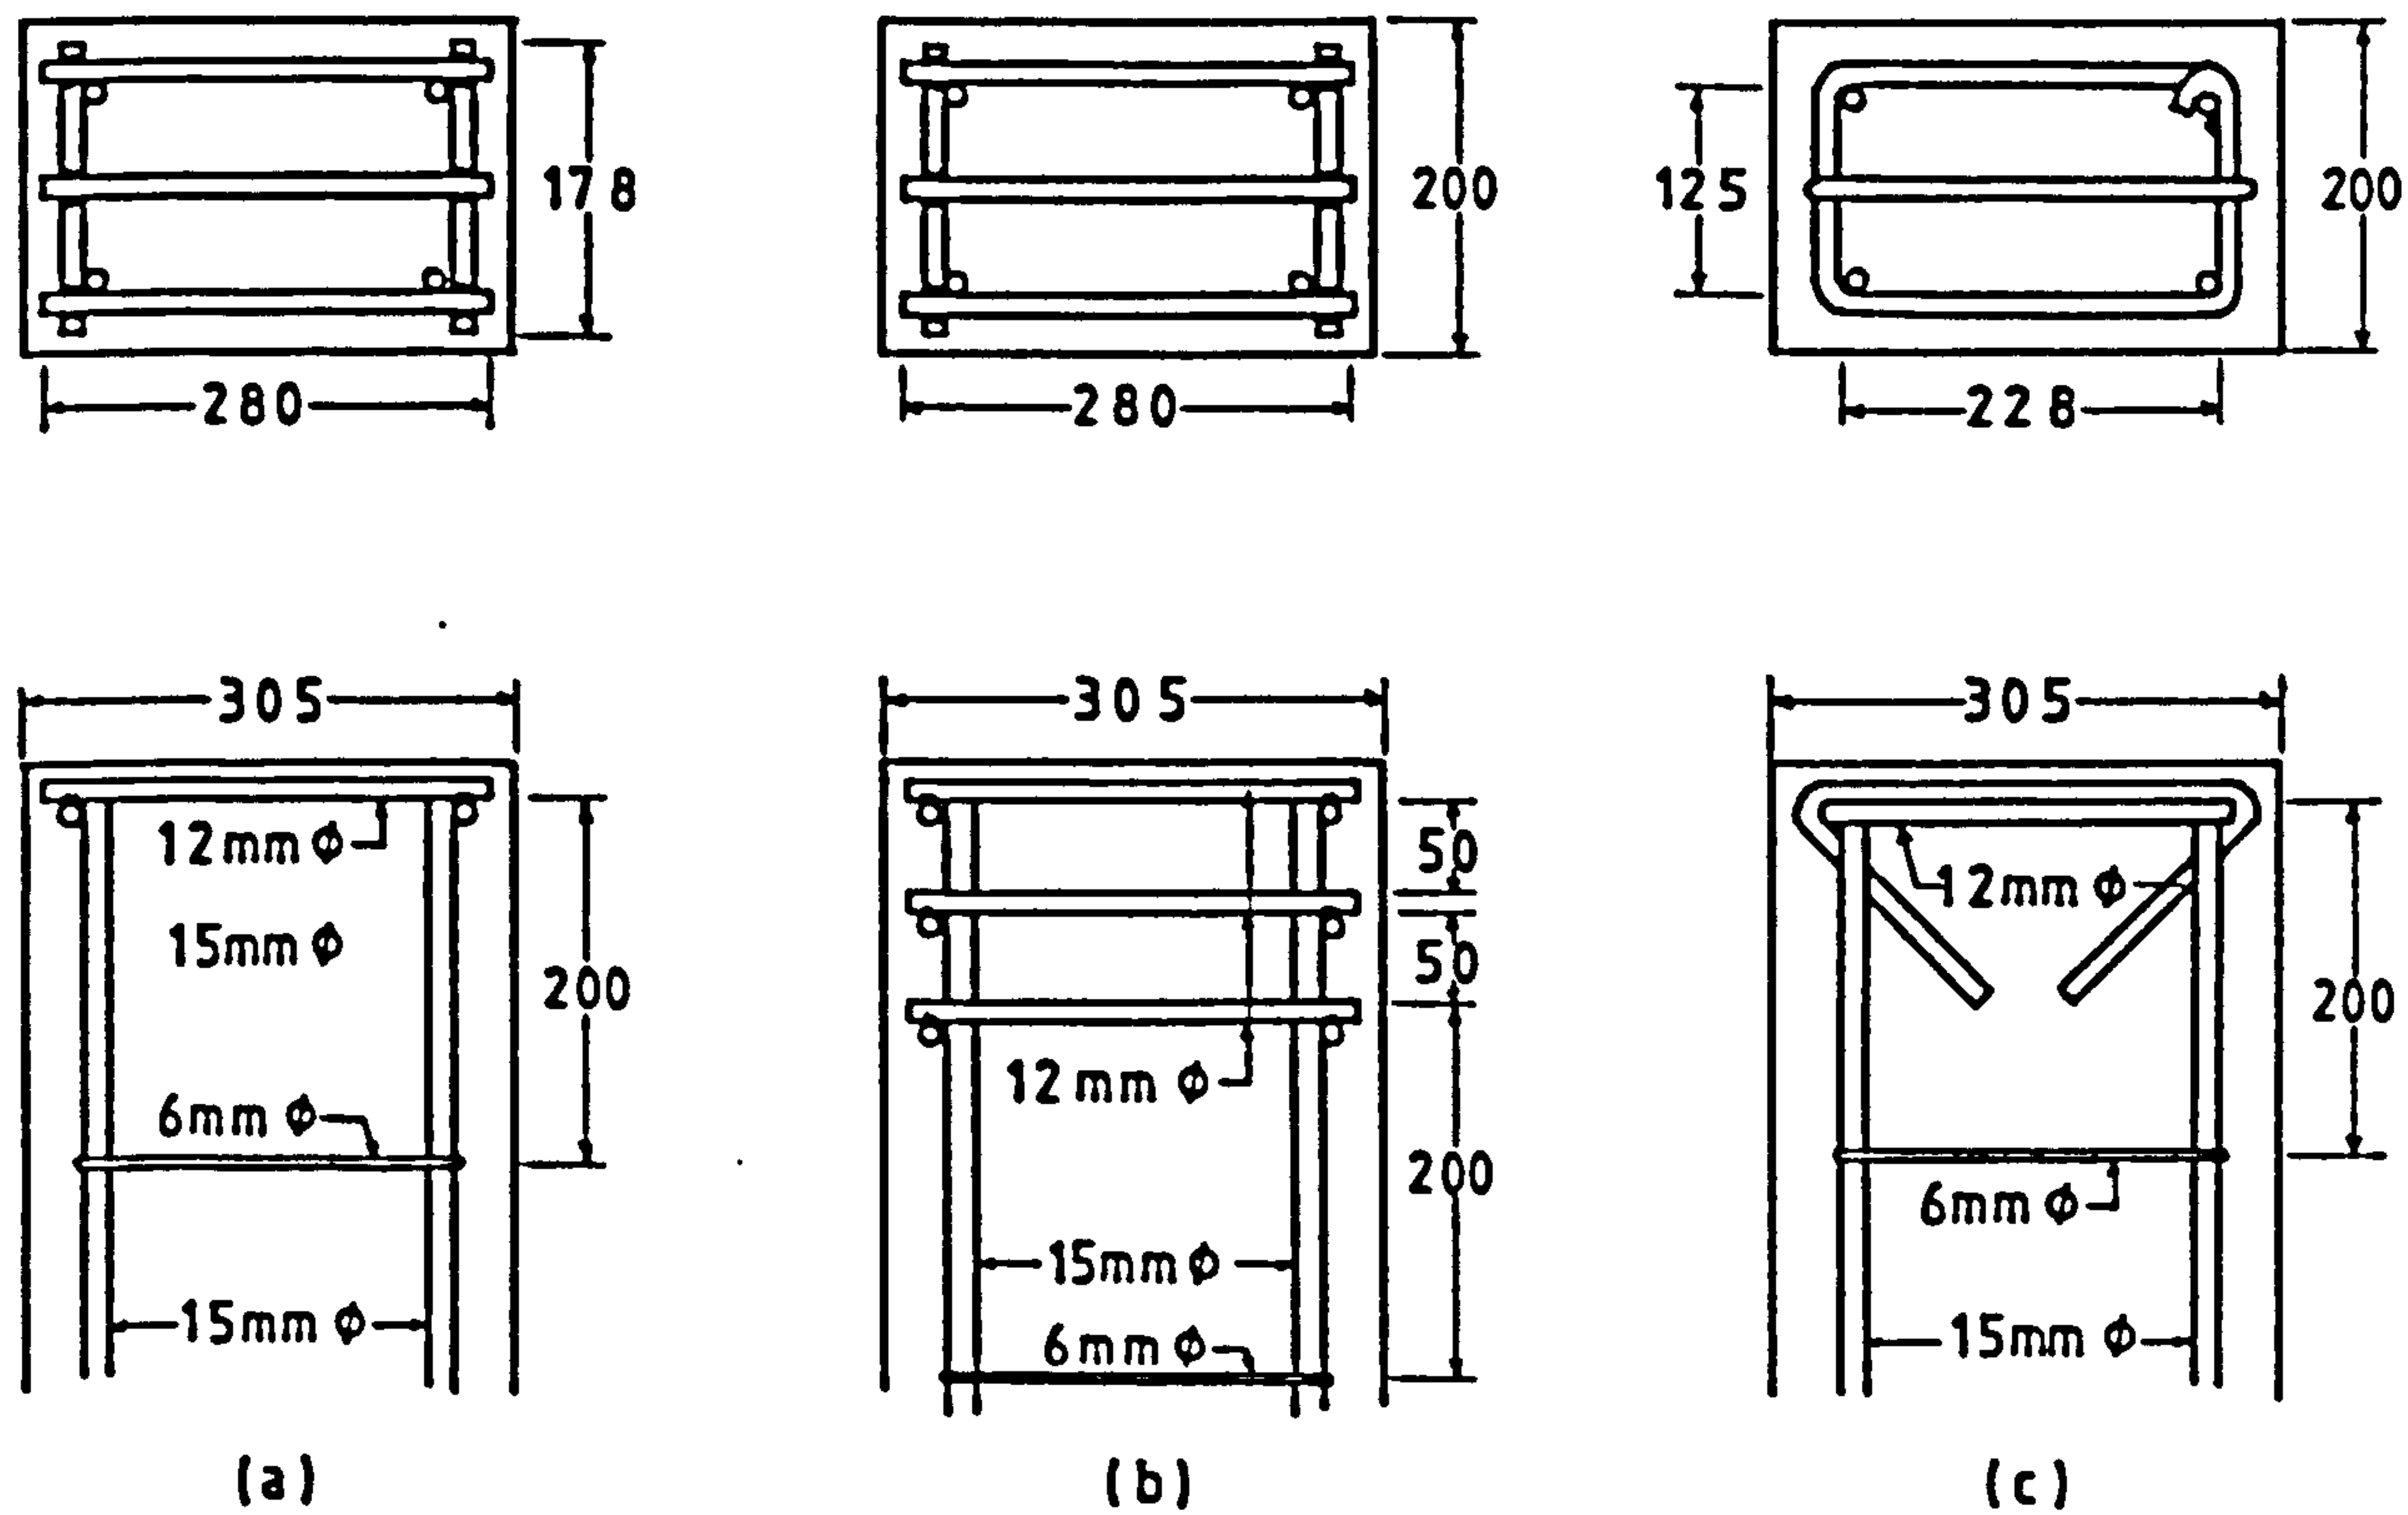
Reinforced concrete column heads tested by Kriz and Rath (1963)
